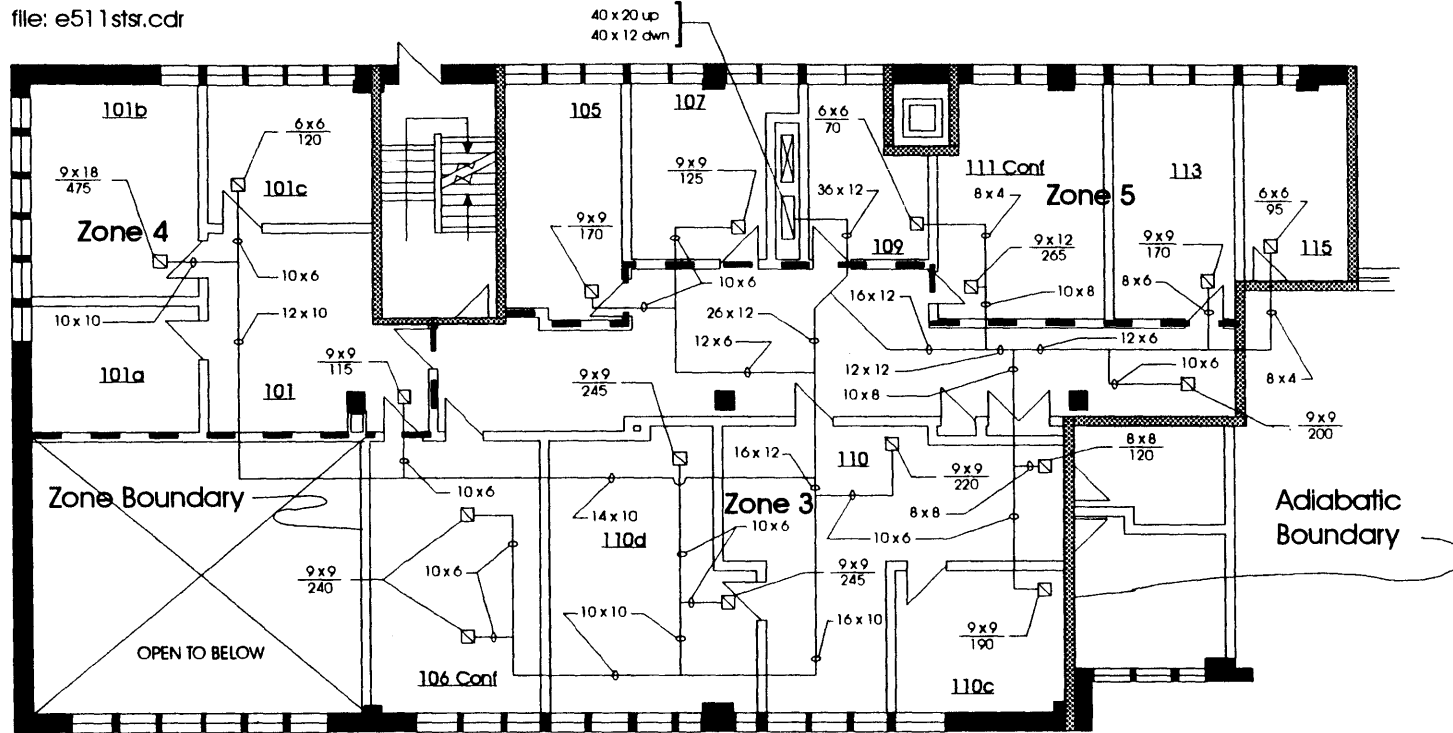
Building E51 - First Floor Level Return Ducting w/ Zoning Option F
